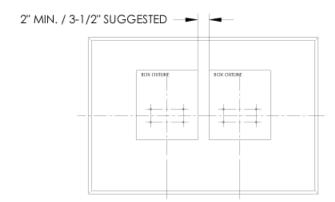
versatile™ Pedestal Single Column Unit Next to Single Column Unit
